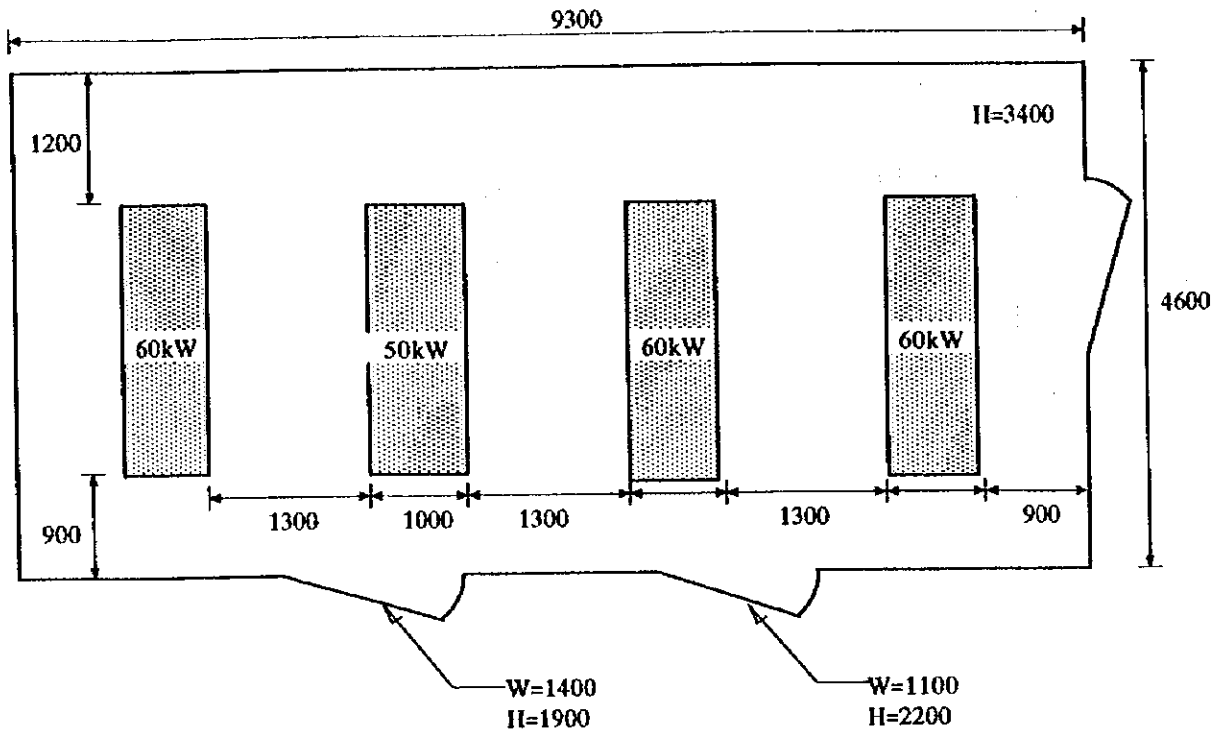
25 Layout Drawing of Khatanbulag
